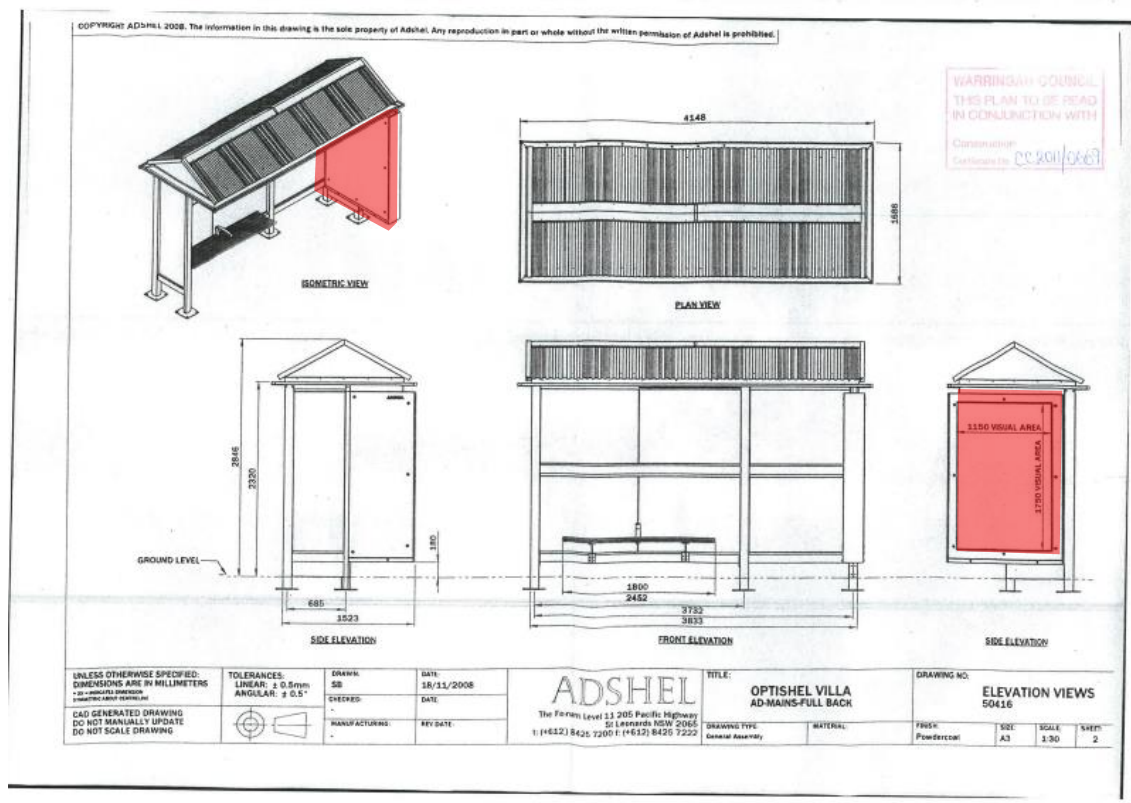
Shelter K4 CC2011/0669 Stamped Elevations indicating advertising panel (shaded red)
